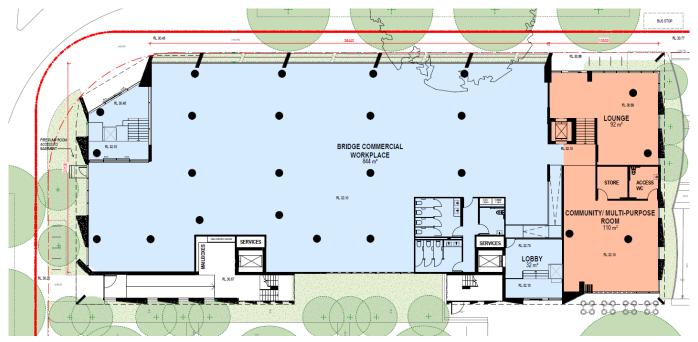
Building S4 Plan – Ground Level, Indicating Commercial Office Use
